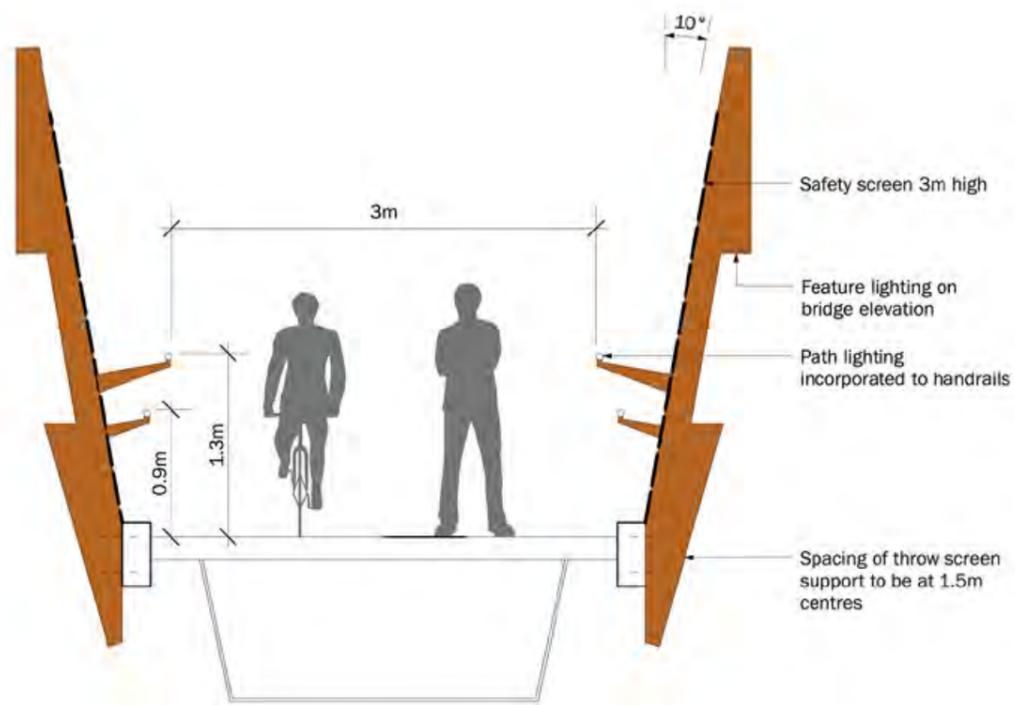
Bridge over Mount Ousley Road- Section (Scale 1:50)
